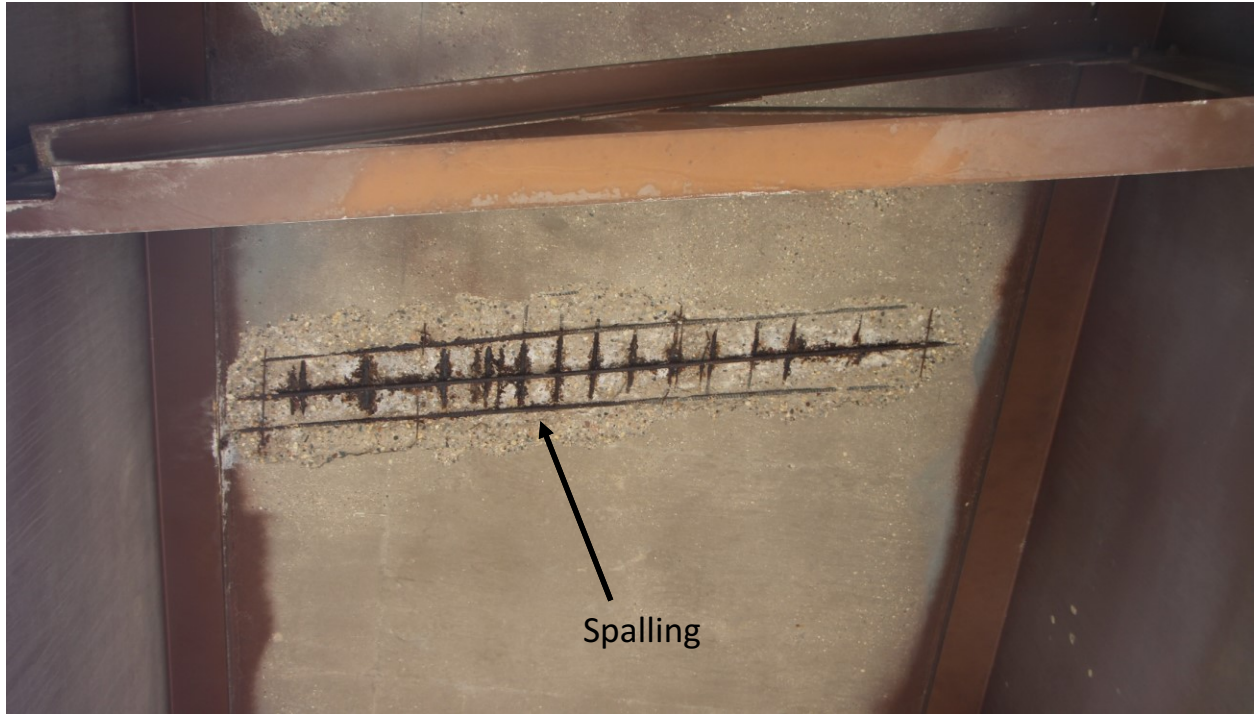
Spalling with exposed rebar on the underside of the deck
